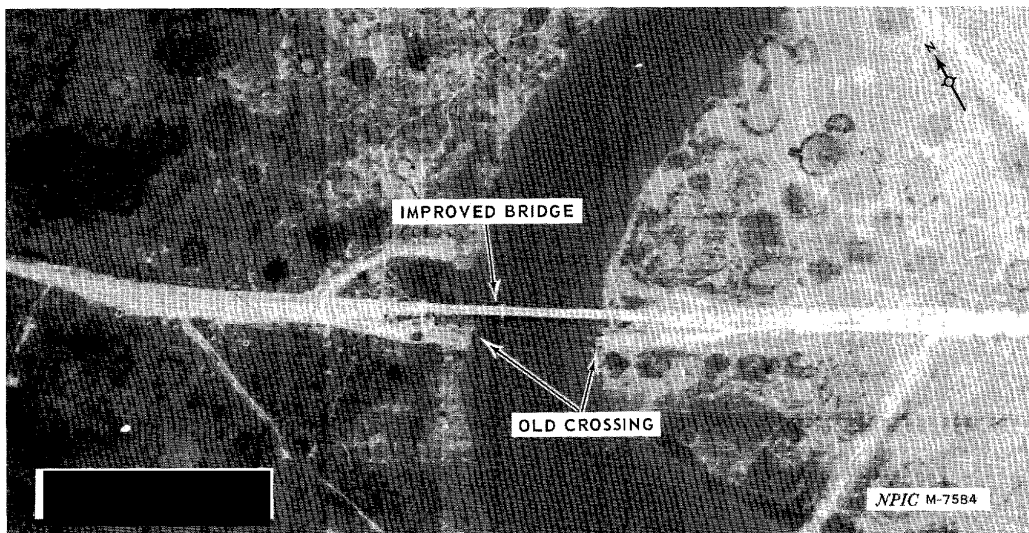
BRIDGE UNDER CONSTRUCTION, THO SON, NORTH VIETNAM
